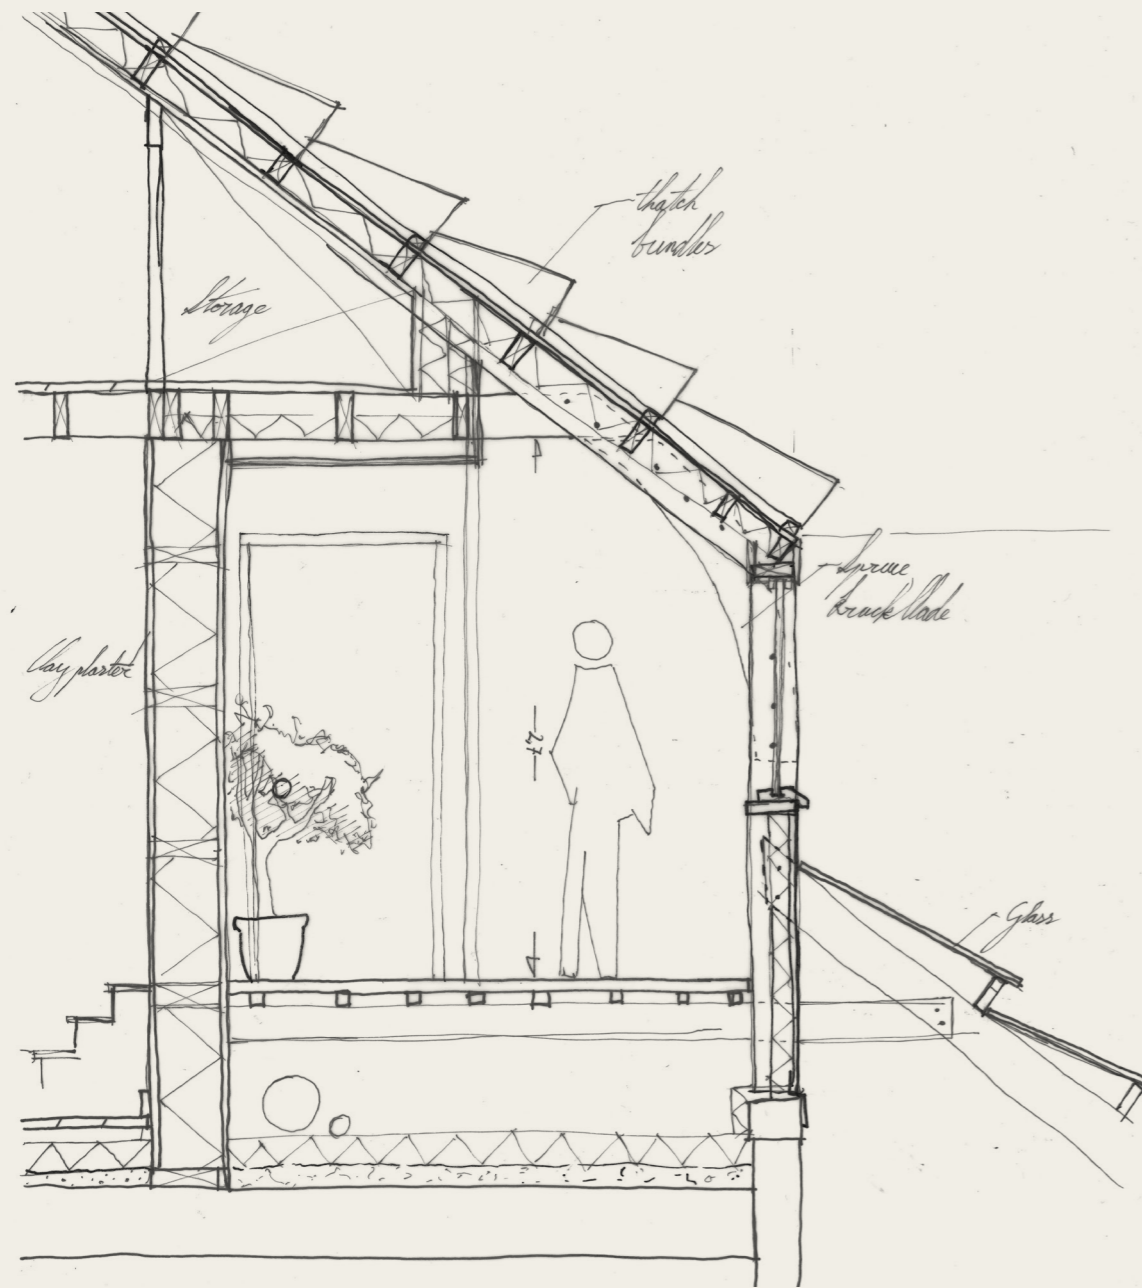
1:20 section sketch testing materiality: thatched branch-bundle roof, krommer, rafter and layered build-up. Own work.
